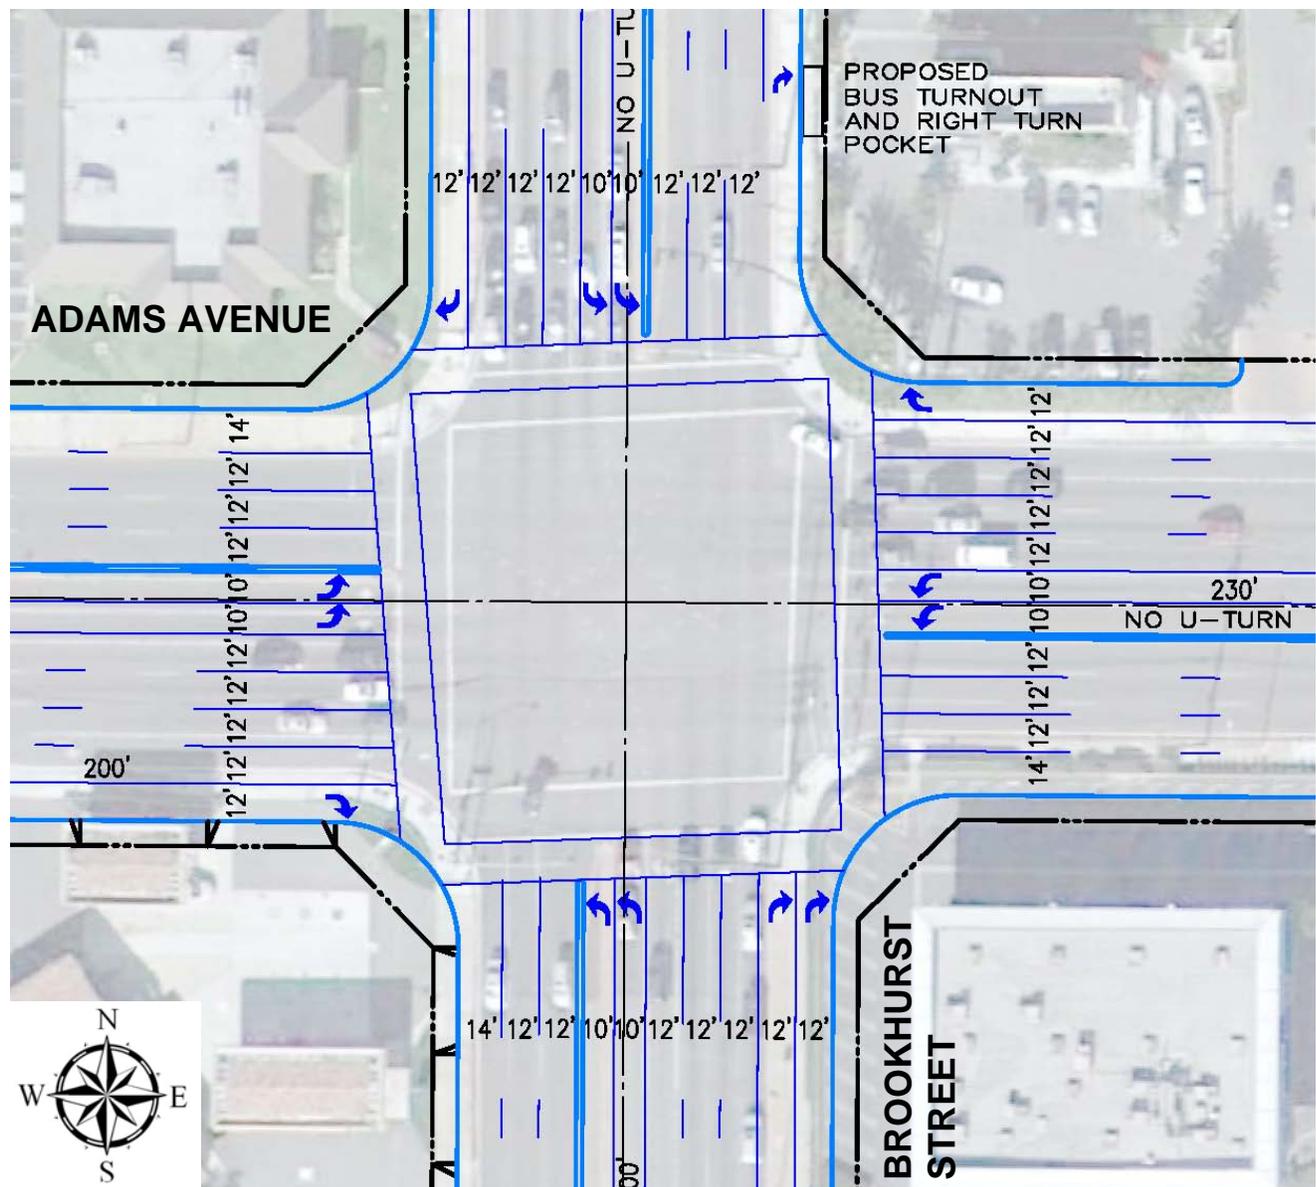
Proposed Alternative 2 Intersection Layout (12' wide thru lanes)
